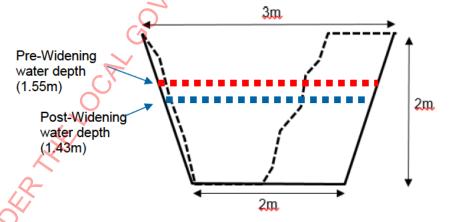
Sketch of proposed stream widening between Wellington Road and Upper Fitzherbert Road
